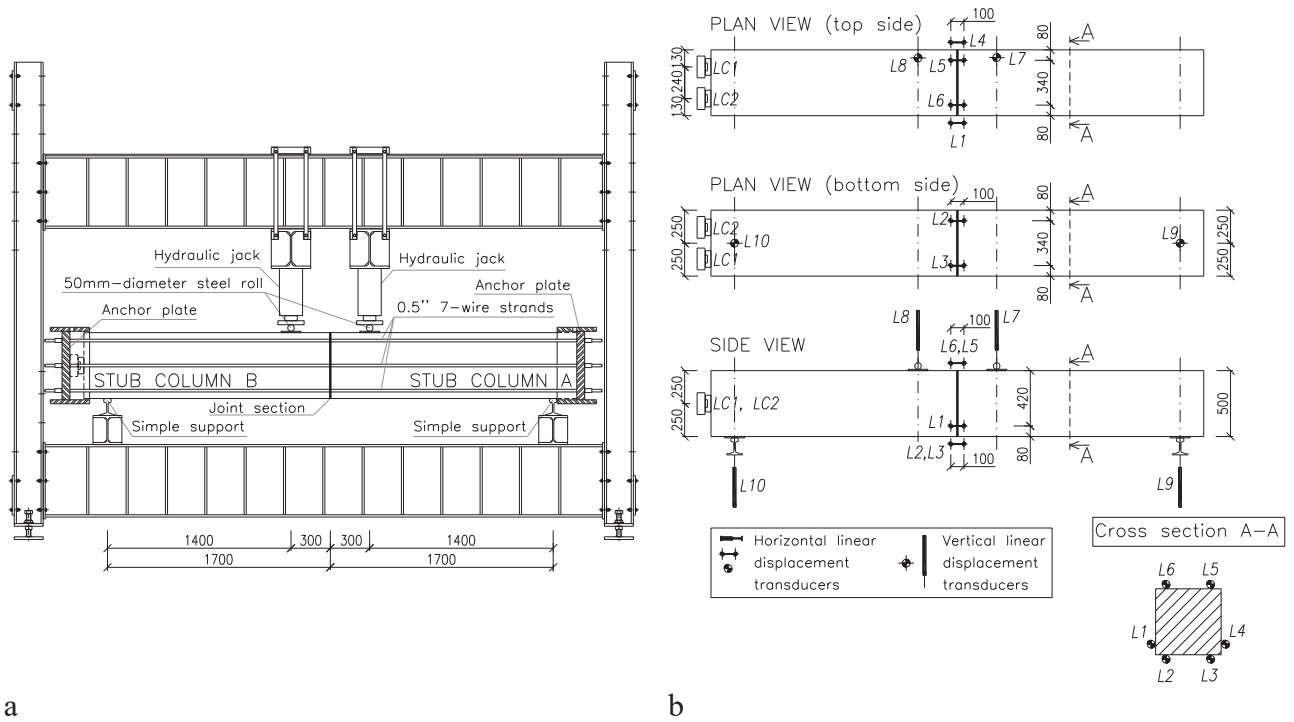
Test with combined bending and axial load: (a) test setup (side view) and (b) locations of the linear displacement transducers. Dimensions in mm.
